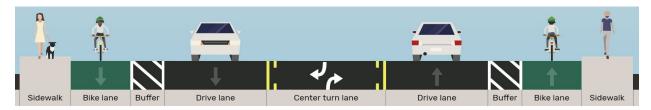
Typical Cross-Section—Alternative 3 (Road Diet)
